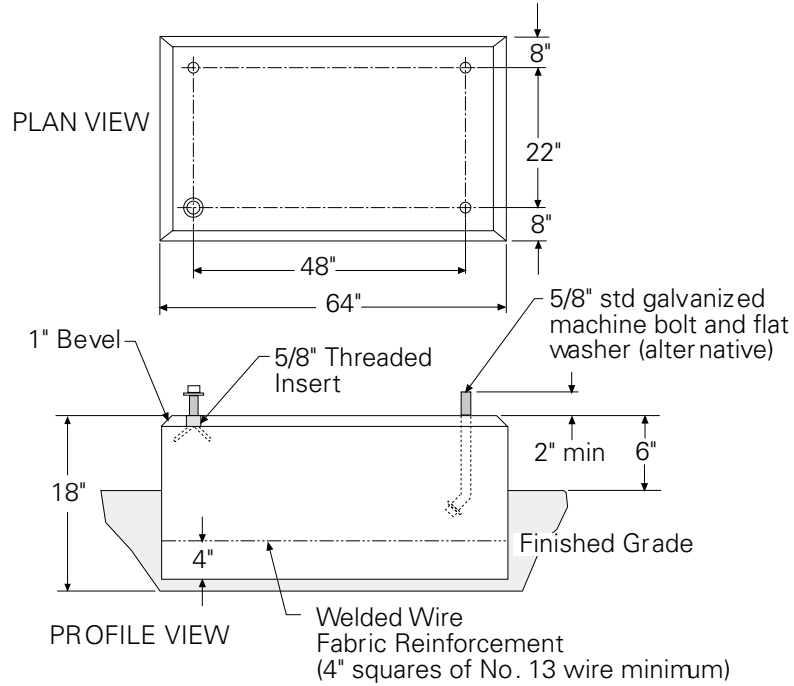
Location of anchoring holes and hardware in foundation of substation frame.
